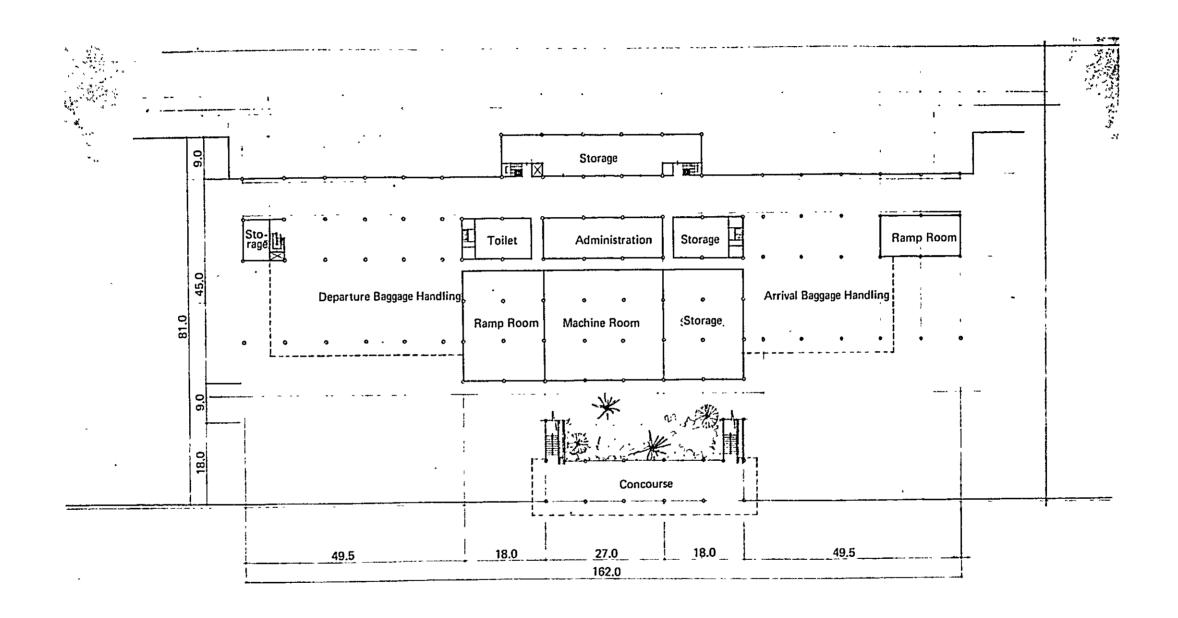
Proposed International Airport Terminal Building Basement Floor Plan
